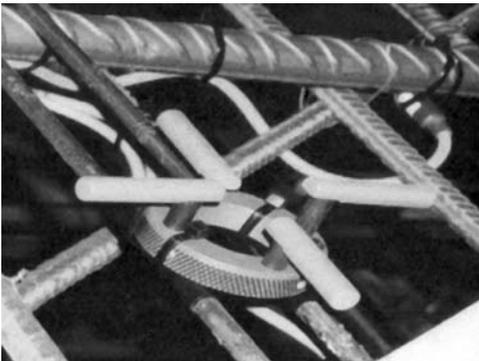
Probe for automatic monitoring of chloride penetration into concrete structures: CorroWatch (source: Germann (2008)).
